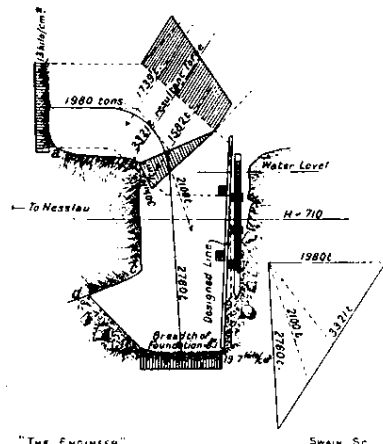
FIRST THUR BRIDGE—LEFT-HAND ABUTMENT
